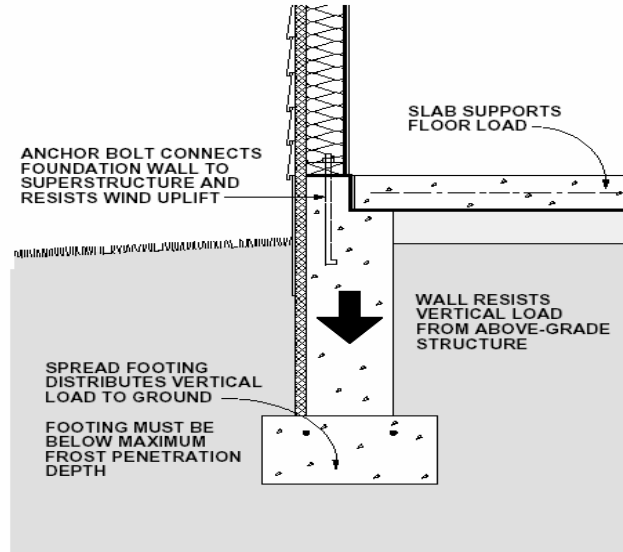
Structural Components of Slab-on-Grade Foundation with Stem Wall and Footing
